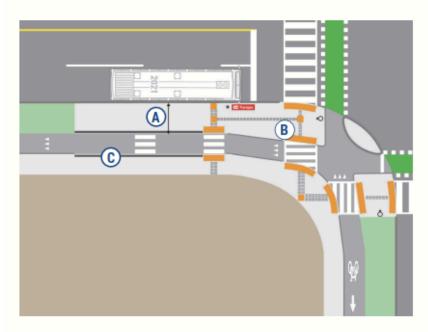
Standard protected intersection showing pedestrian crossings with and without a refuge
